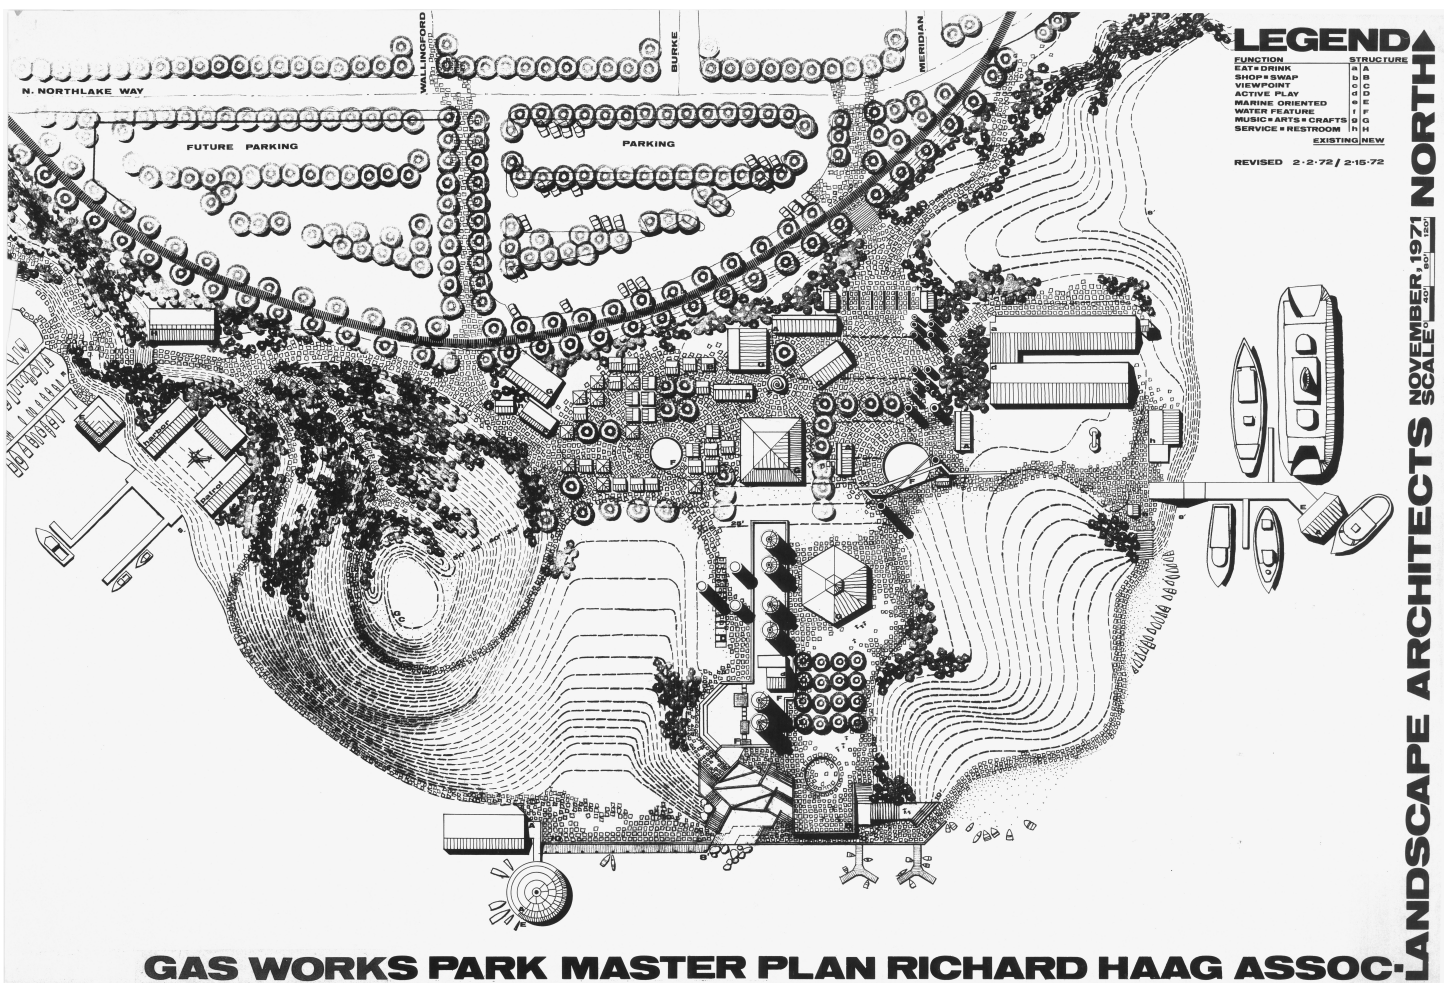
Gas Works Park Master Plan, by Richard Haag
